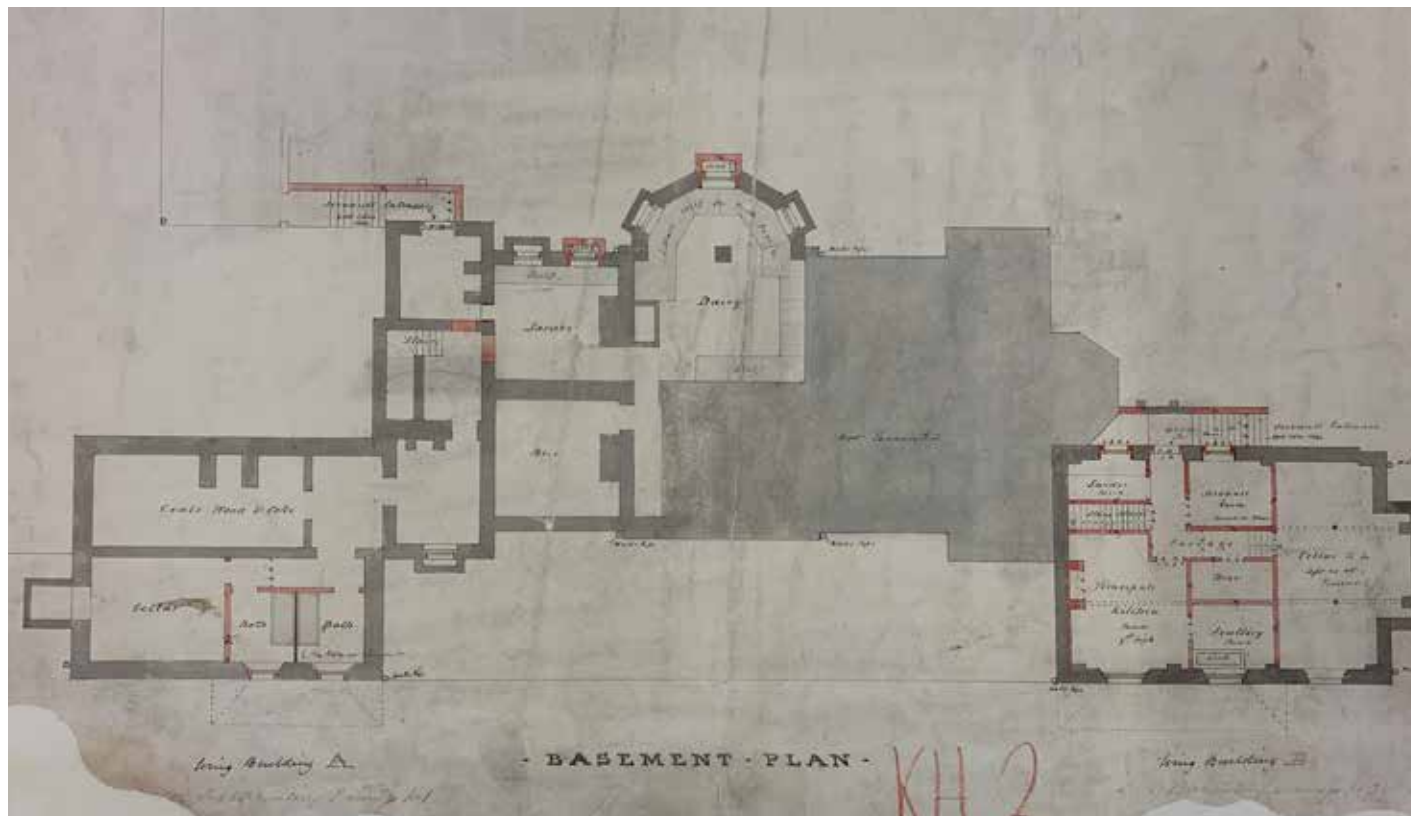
1848 proposed basement plan of Kneller Hall, unrealised (black showing the existing building and red showing the proposal). By George Mair.
